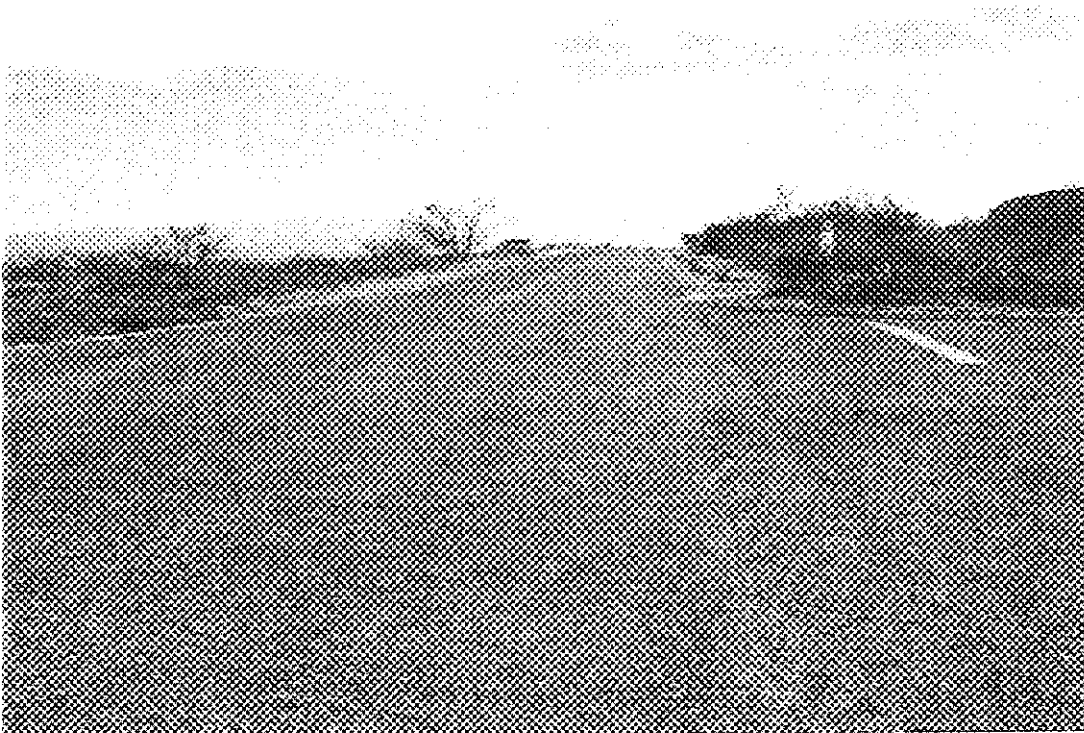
MP 0.00 - Begin route at Panther Junction, typical pavement section
